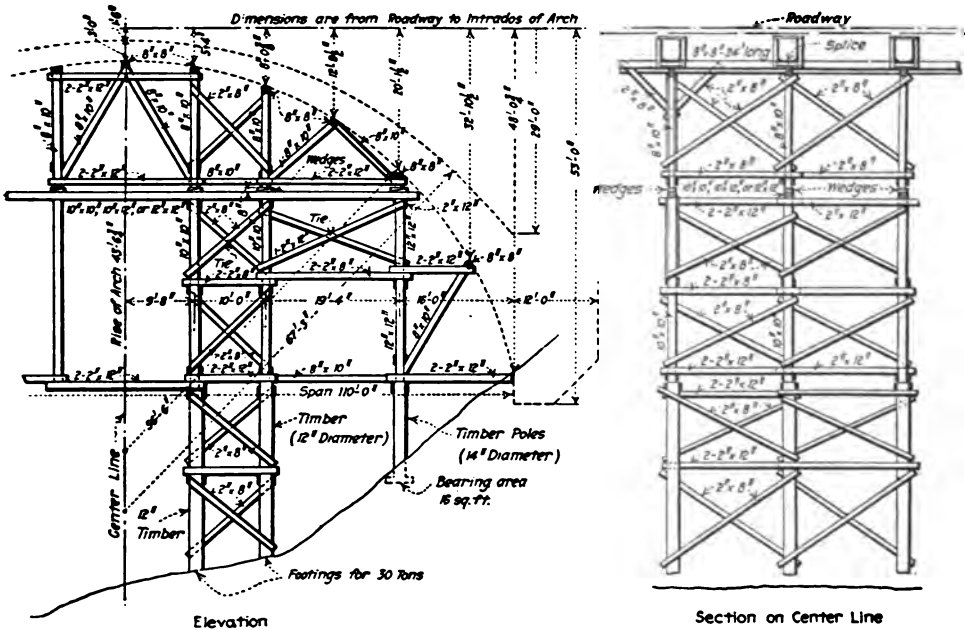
A.—Centering for bridge over ravine on Mississippi River Boulevard, St. Paul, Minn.
